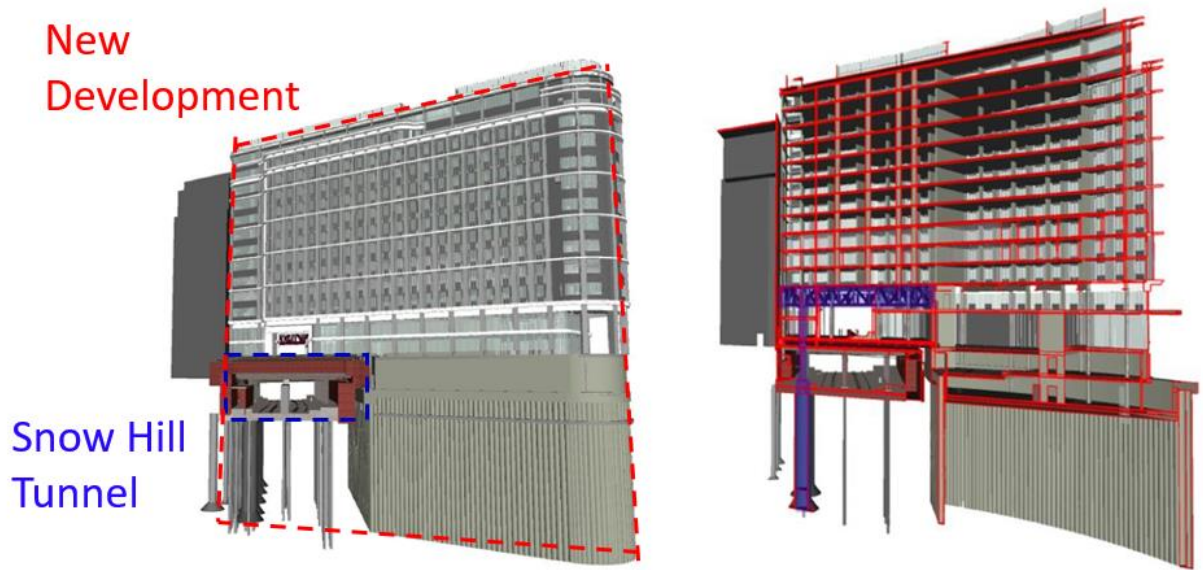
Proposed Scheme with Railway Tunnel Interface. RIGHT- Transfer Truss, Columns and Caisson Piles in BLUE
